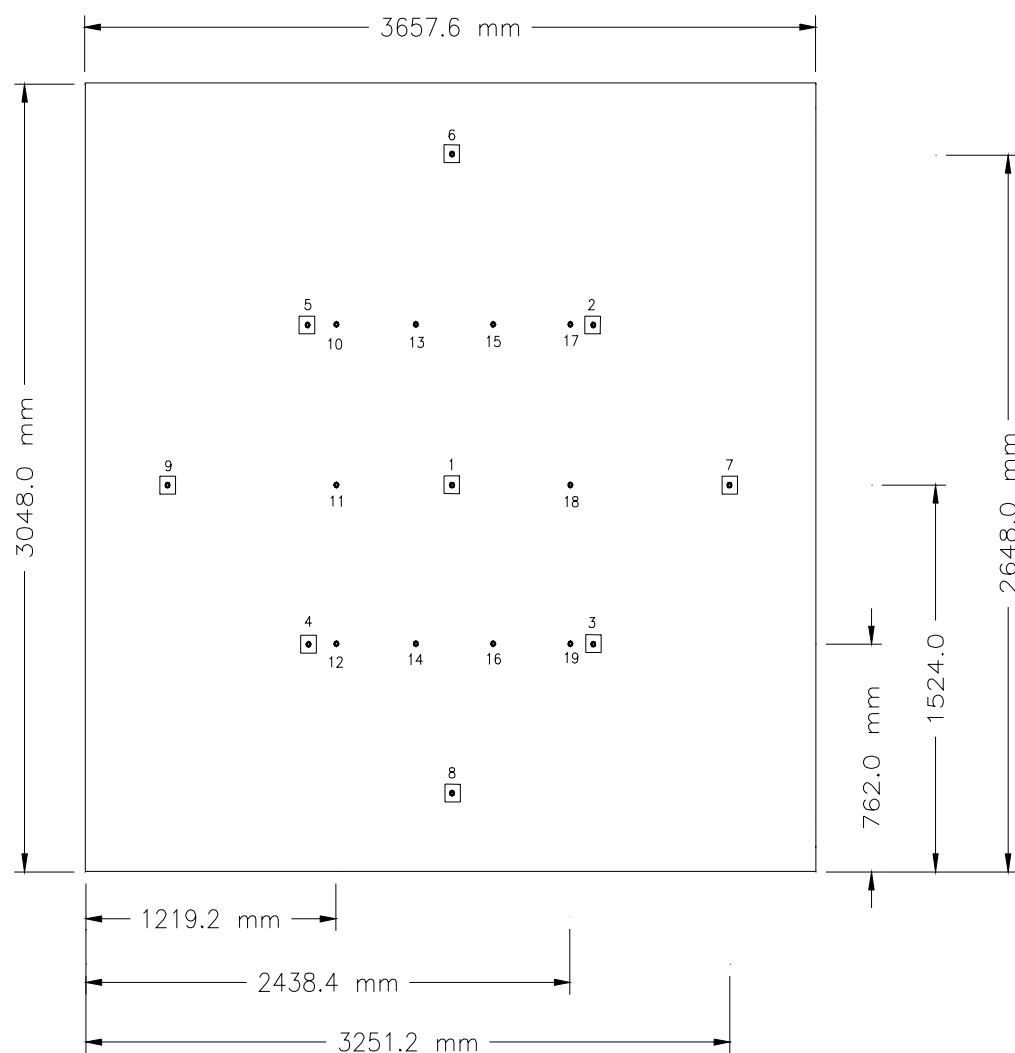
Screw Locations For Steel Stud, 1x2 Gypsum Board Layers,
